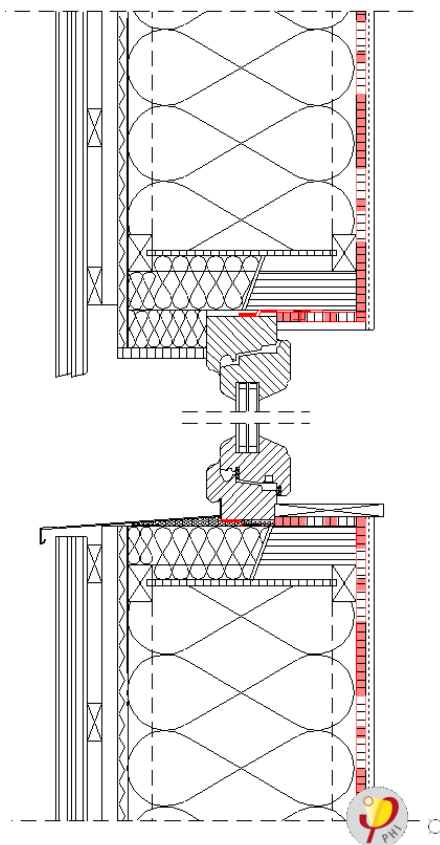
Optimised installation situation: window in a lightweight timber wall. The window is positioned in the middle of the wall, i.e. in the centre of the insulating layer. The frame can be largely covered with extended insulation at the reveal and the lintel. The thermal bridge effect
